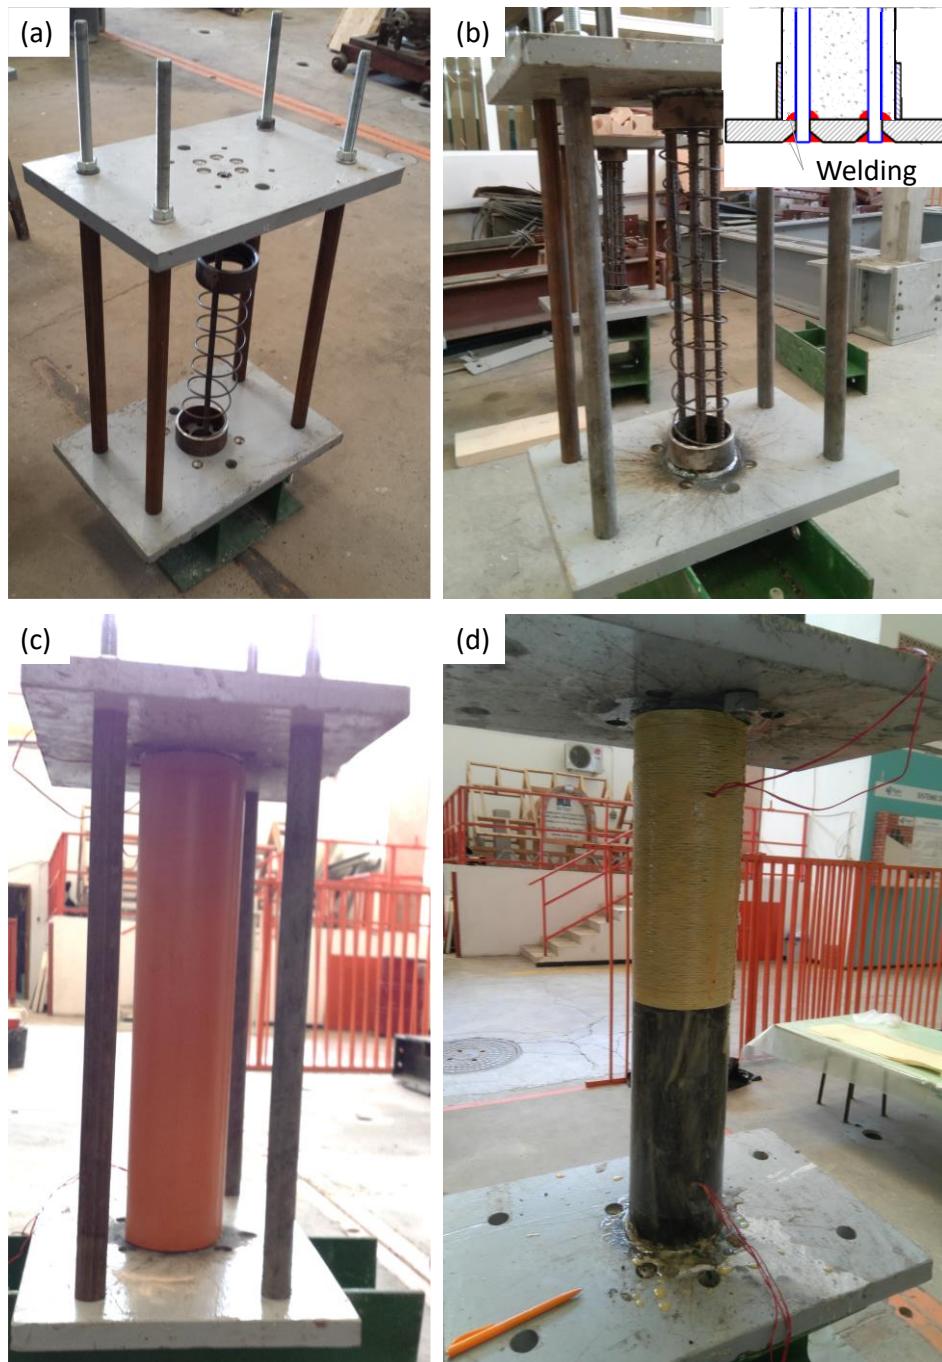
Manufacture of the CRuC base-isolator: a) Positioning of steel plates, caps, and reinforcement, b) Welding of reinforcement, c) Formwork and casting, d) AFRP confinement
